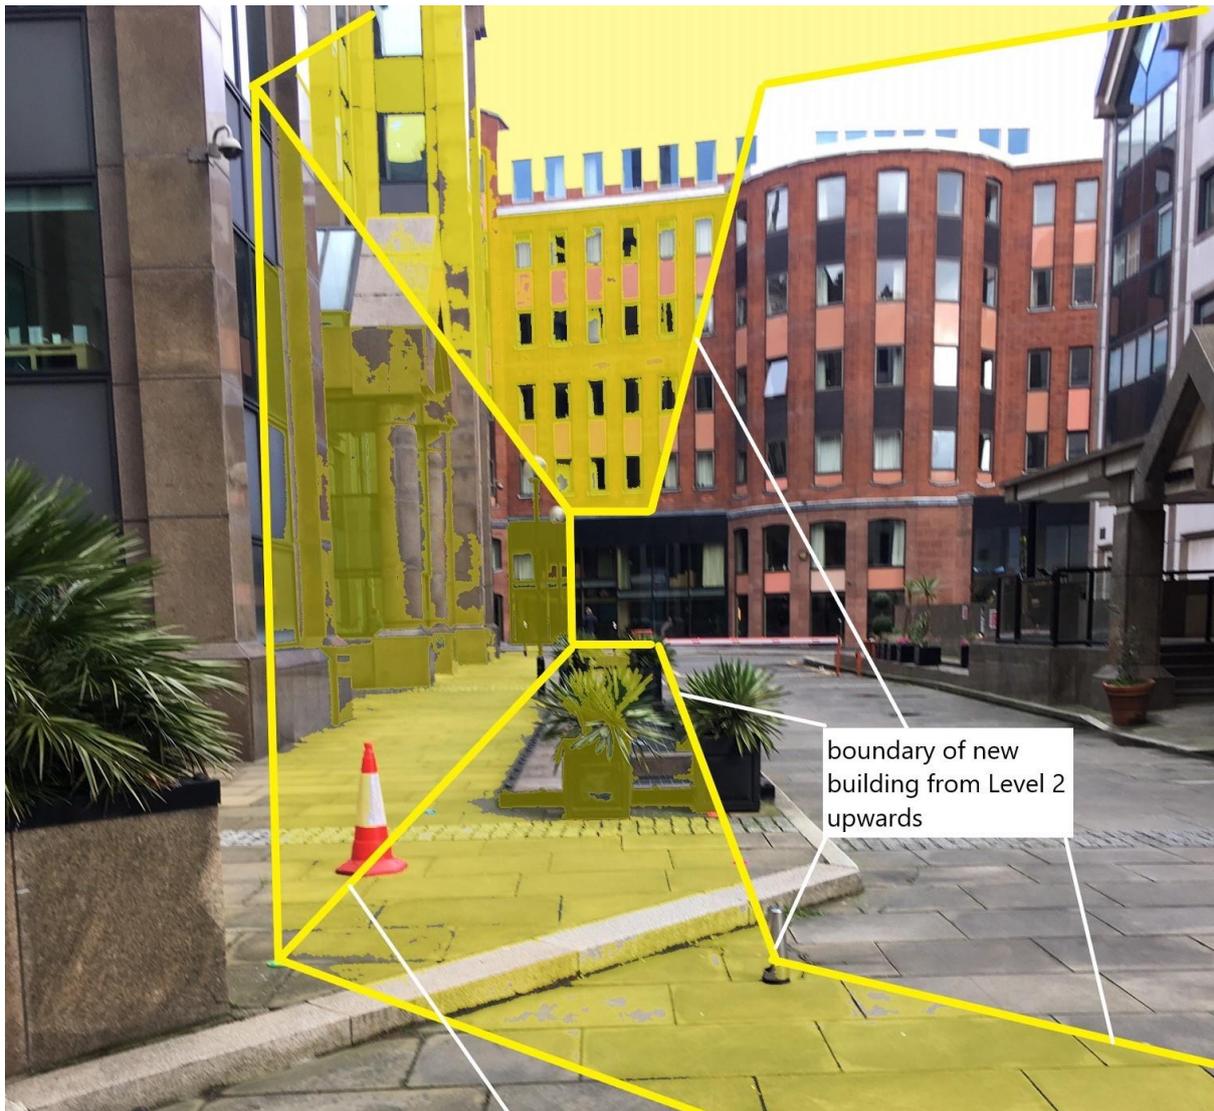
Norfolk House enjoys Roadway access which is protected by legal rights-of-way; proposed development over Roadway leaves inadequate space to meet CoL Highways requirements, for traffic leaving/returning to Trig Lane, a public highway.
